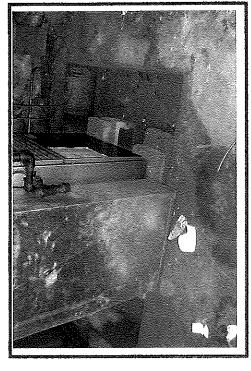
Air conditioning compressor in a pit in the basement of 108 N. $7^{\rm th}$ Street.
